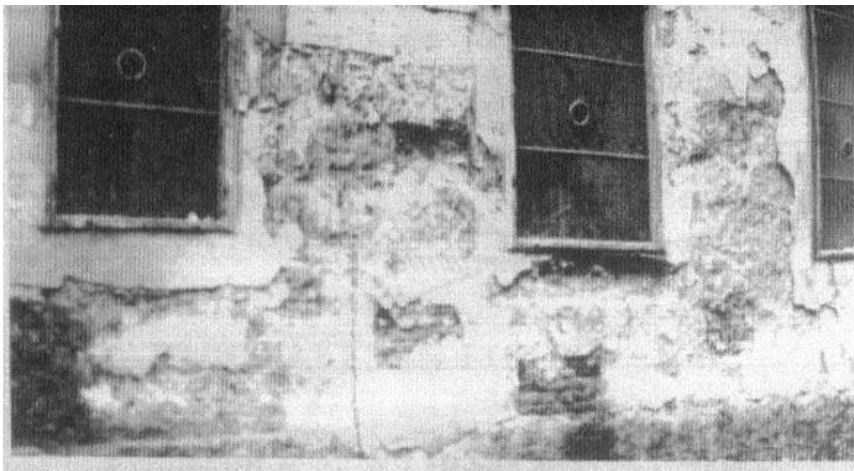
Deteriorate surface of stone masonry due to poor maintenance and construction materials.
